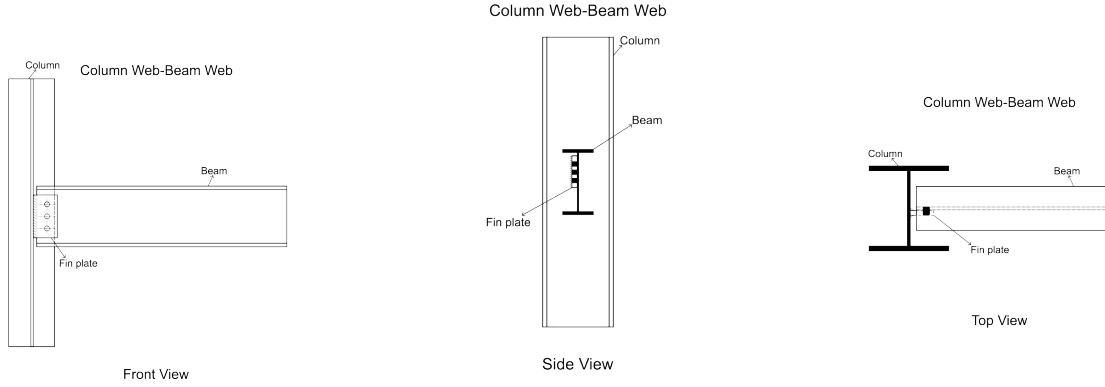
Fin Plate Connection – Column Web-Beam Web
